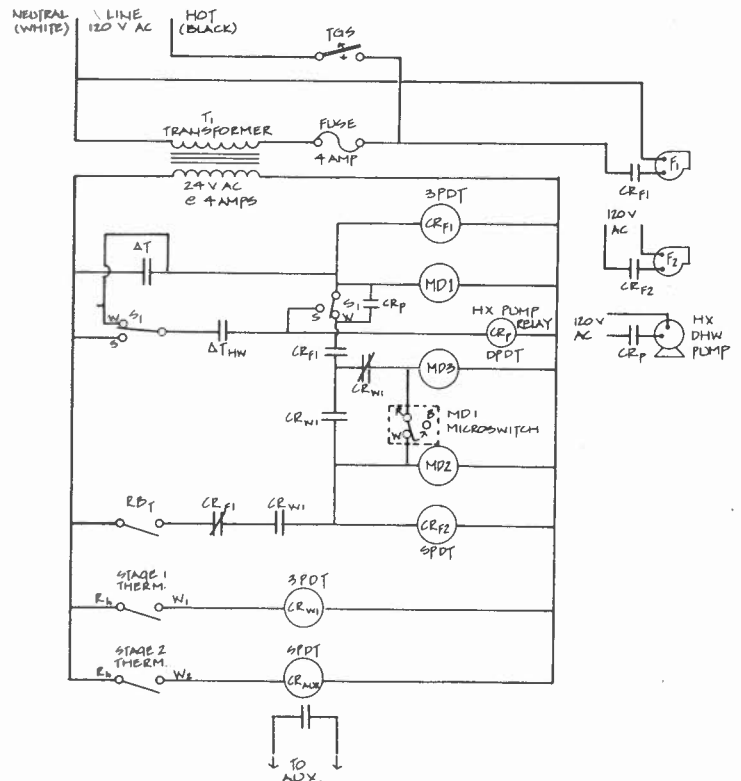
Retrofit Wiring Schematic: Parallel Auxiliary Wall Collector With Storage
